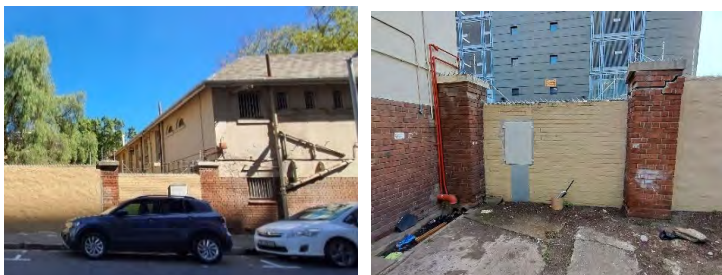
Soils Lab building's gateposts in Prestwich Street
